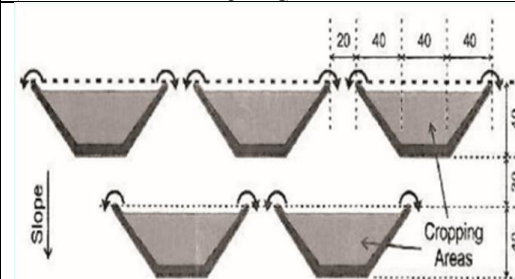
Trapezoidal-shaped planting basins along slope.
